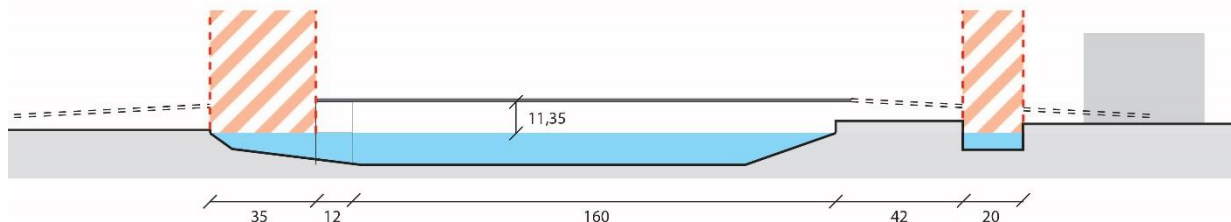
Profile of the proposed Java Bridge layout with movable parts highlighted
